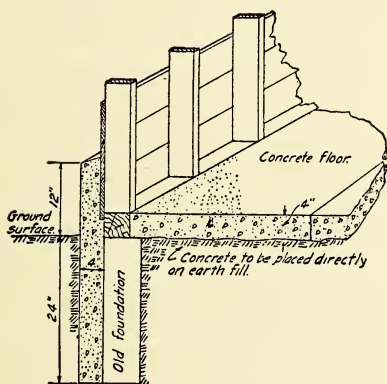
Old buildings where food and feed are kept may be made ratproof by constructing a concrete wall on the outside or inside of the old foundation.
